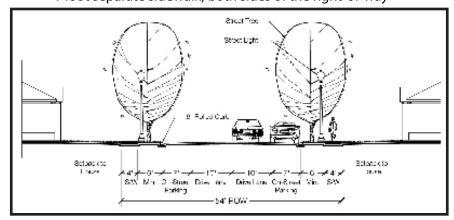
Neighborhood Street - Woodbridge by Del Webb, Section O
